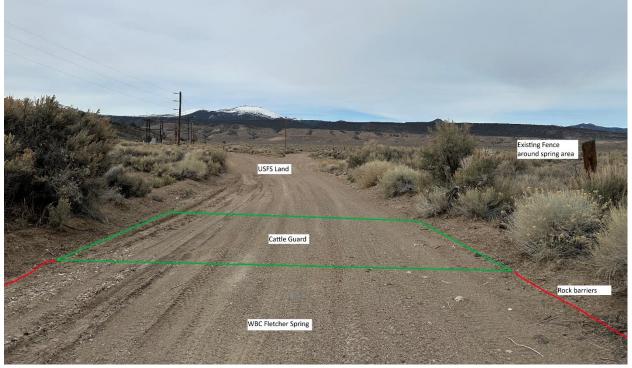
Entrance from west, rock barrier along the access road, cattleguard connecting to the existing fence.
